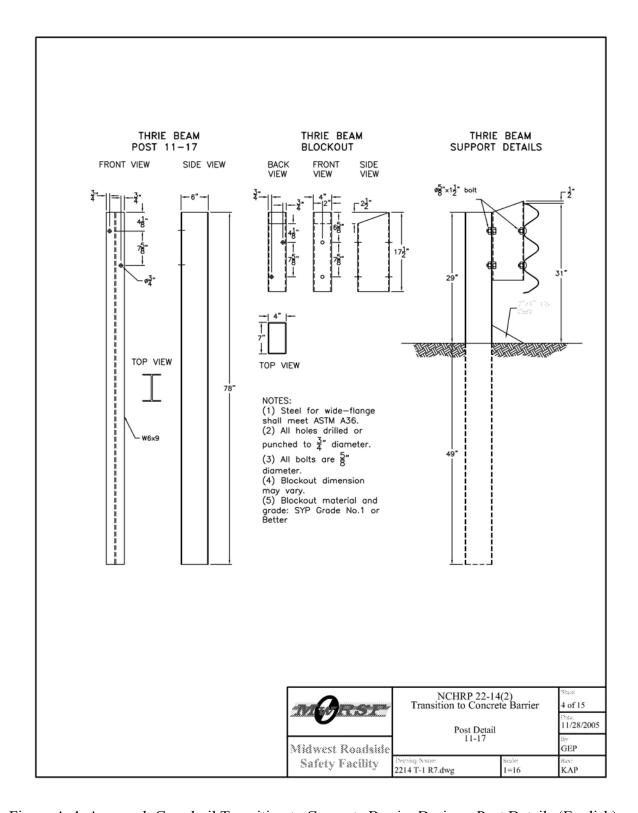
Approach Guardrail Transition to Concrete Barrier Design - Post Details (English)
